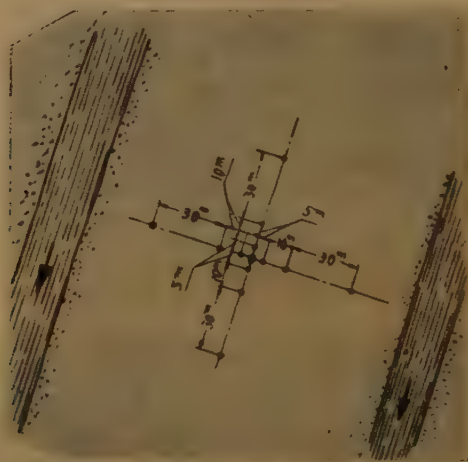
Sample Field and Arrangement of Observation Wells.
